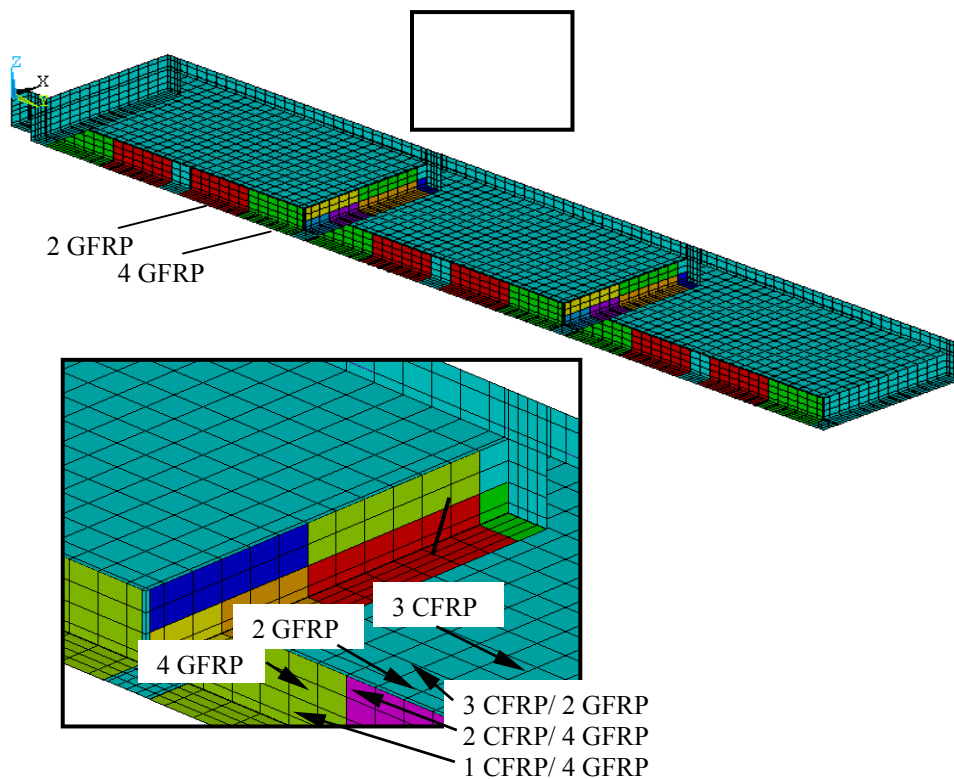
FE Bridge Model Strengthening with FRP Laminates
